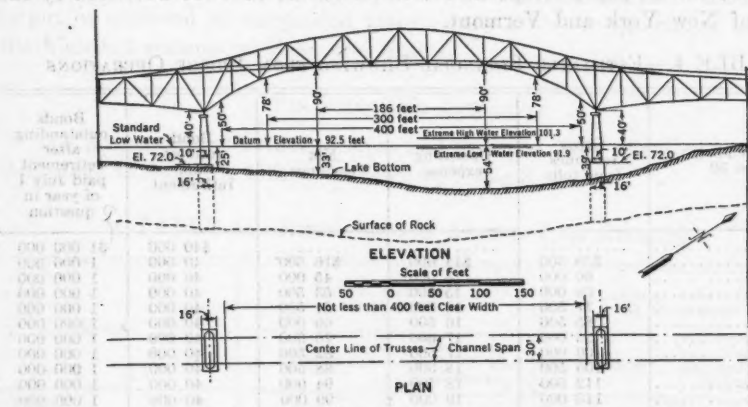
CHANNEL SPAN, LAKE CHAMPLAIN BRIDGE.
